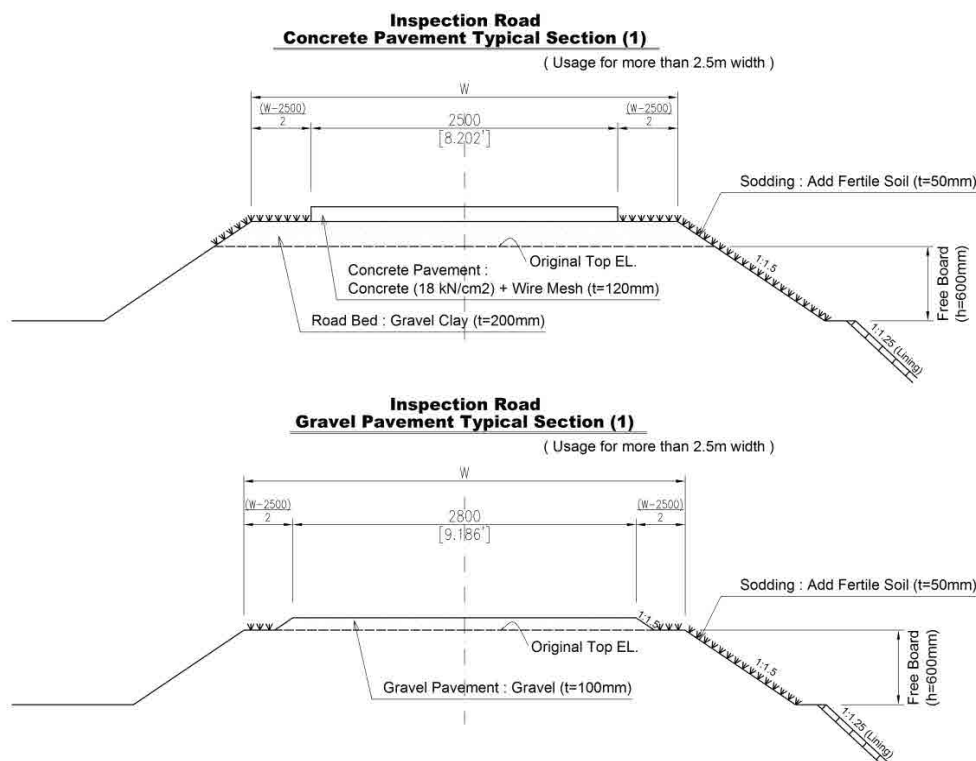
Proposed Inspection Road Pavement for Distribution Canal Road
